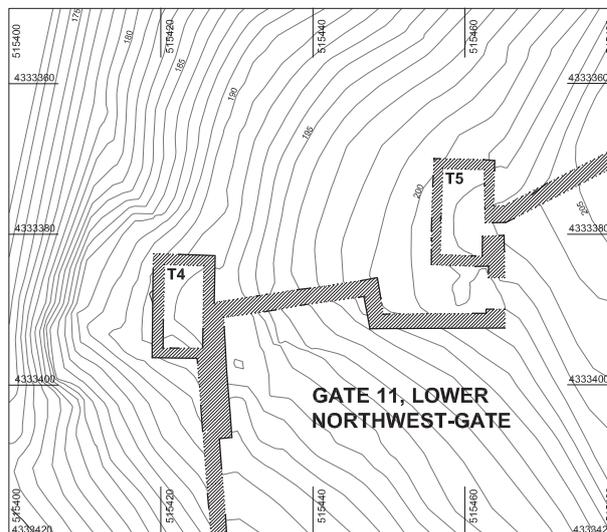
Pergamon, Lower North-West Gate (Gate 11). Ground plan
